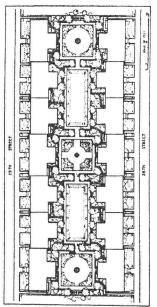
Site Plan, Cambridge Court, George Wells, 1924
